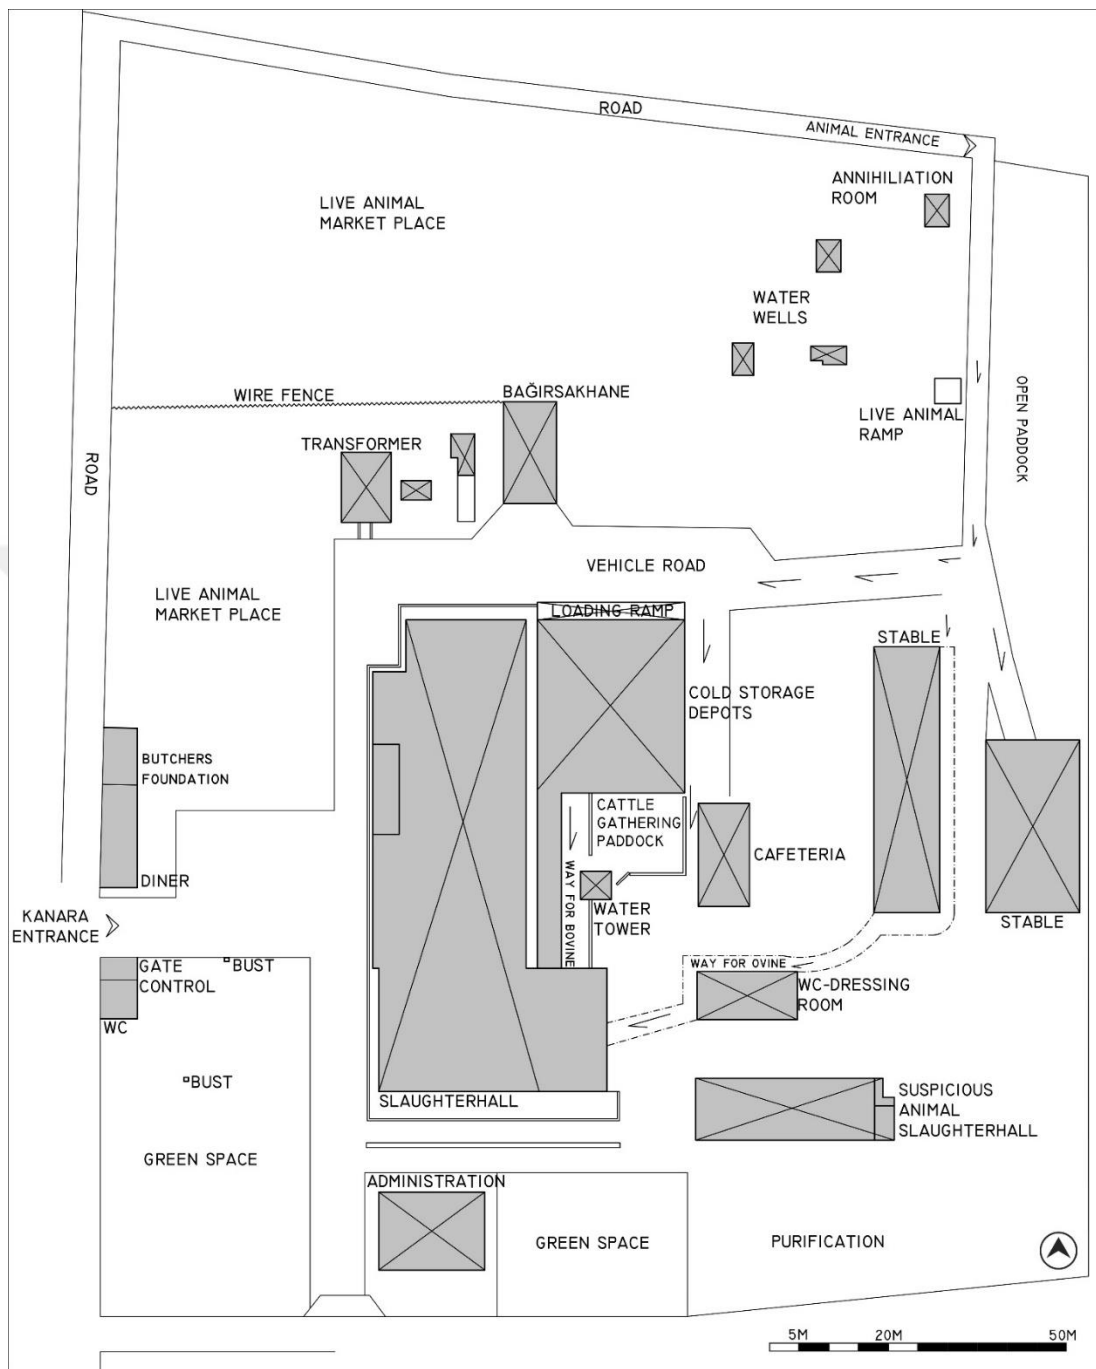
Site plan drawing drawn in 2000s. (Source: redrawn by the author from the drawings at Kanara slaughterhouse archive)
